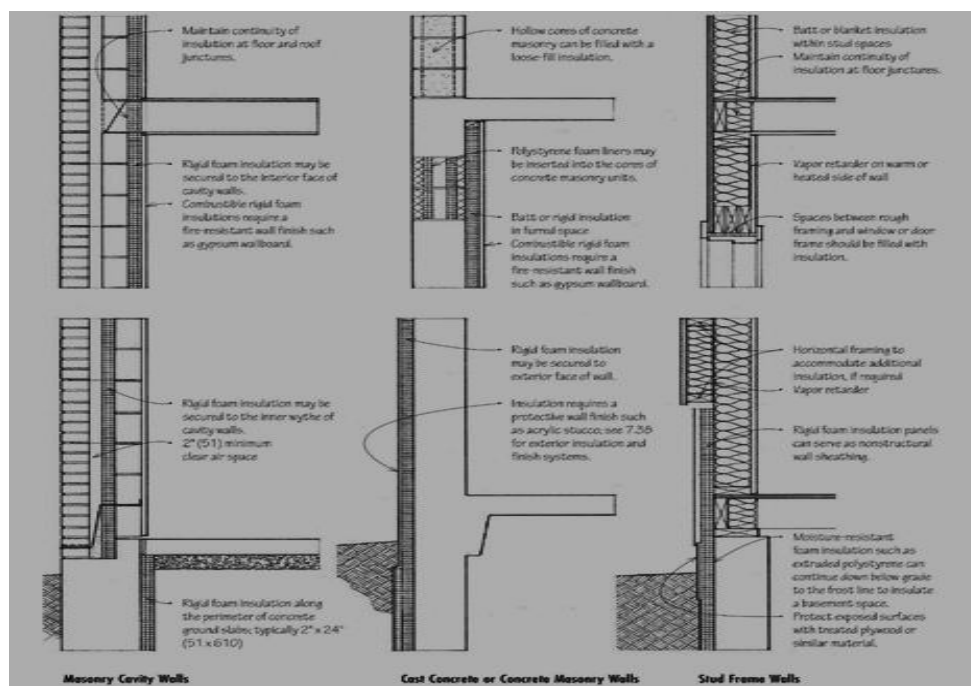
a. Insulating wall techniques: masonry cavity wall, cast concrete wall and wood stud frame wall.
